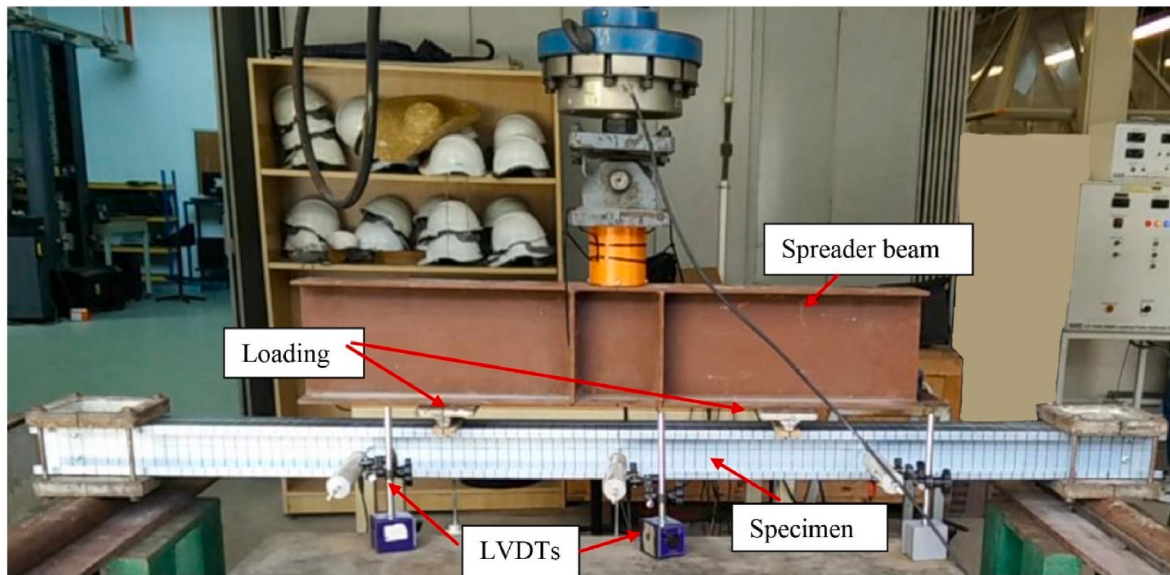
Experimental setup for four-point bending test of back-to-back built-up CFS channel beams [25].
